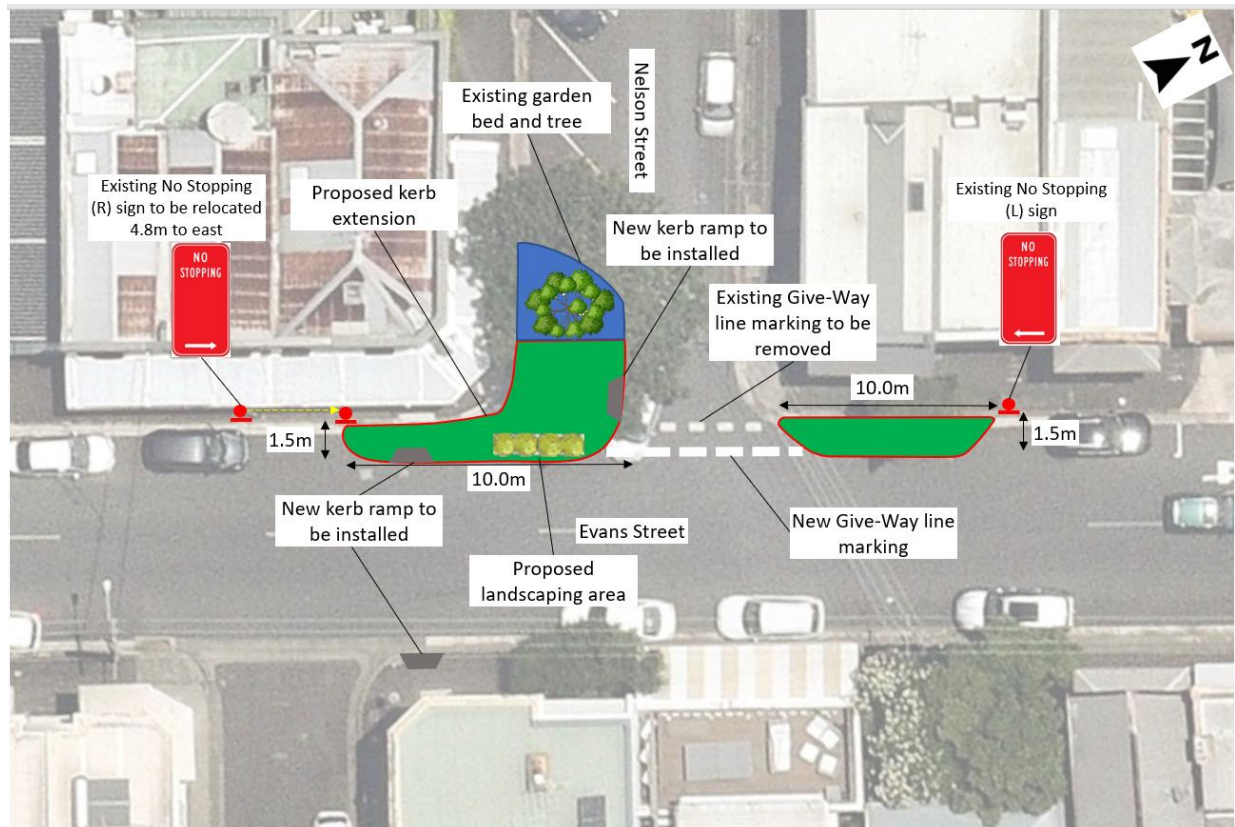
Proposed kerb extension at the intersection of Evans Street and Nelson Street
